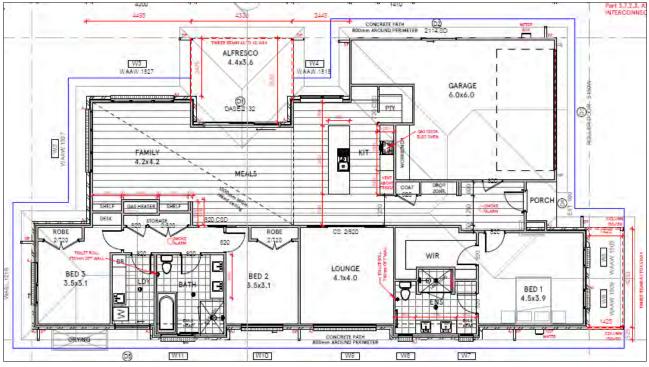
Proposed dwelling plan (Source: Matt Jenkins Homes, 2019)
